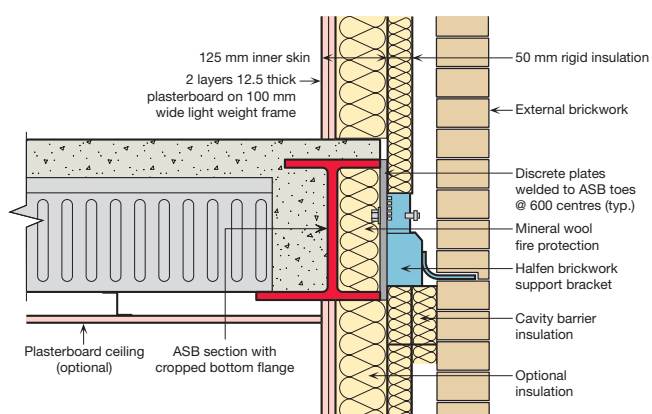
Typical section through an external wall with a cropped Asymmetric Slimflor® edge beam
